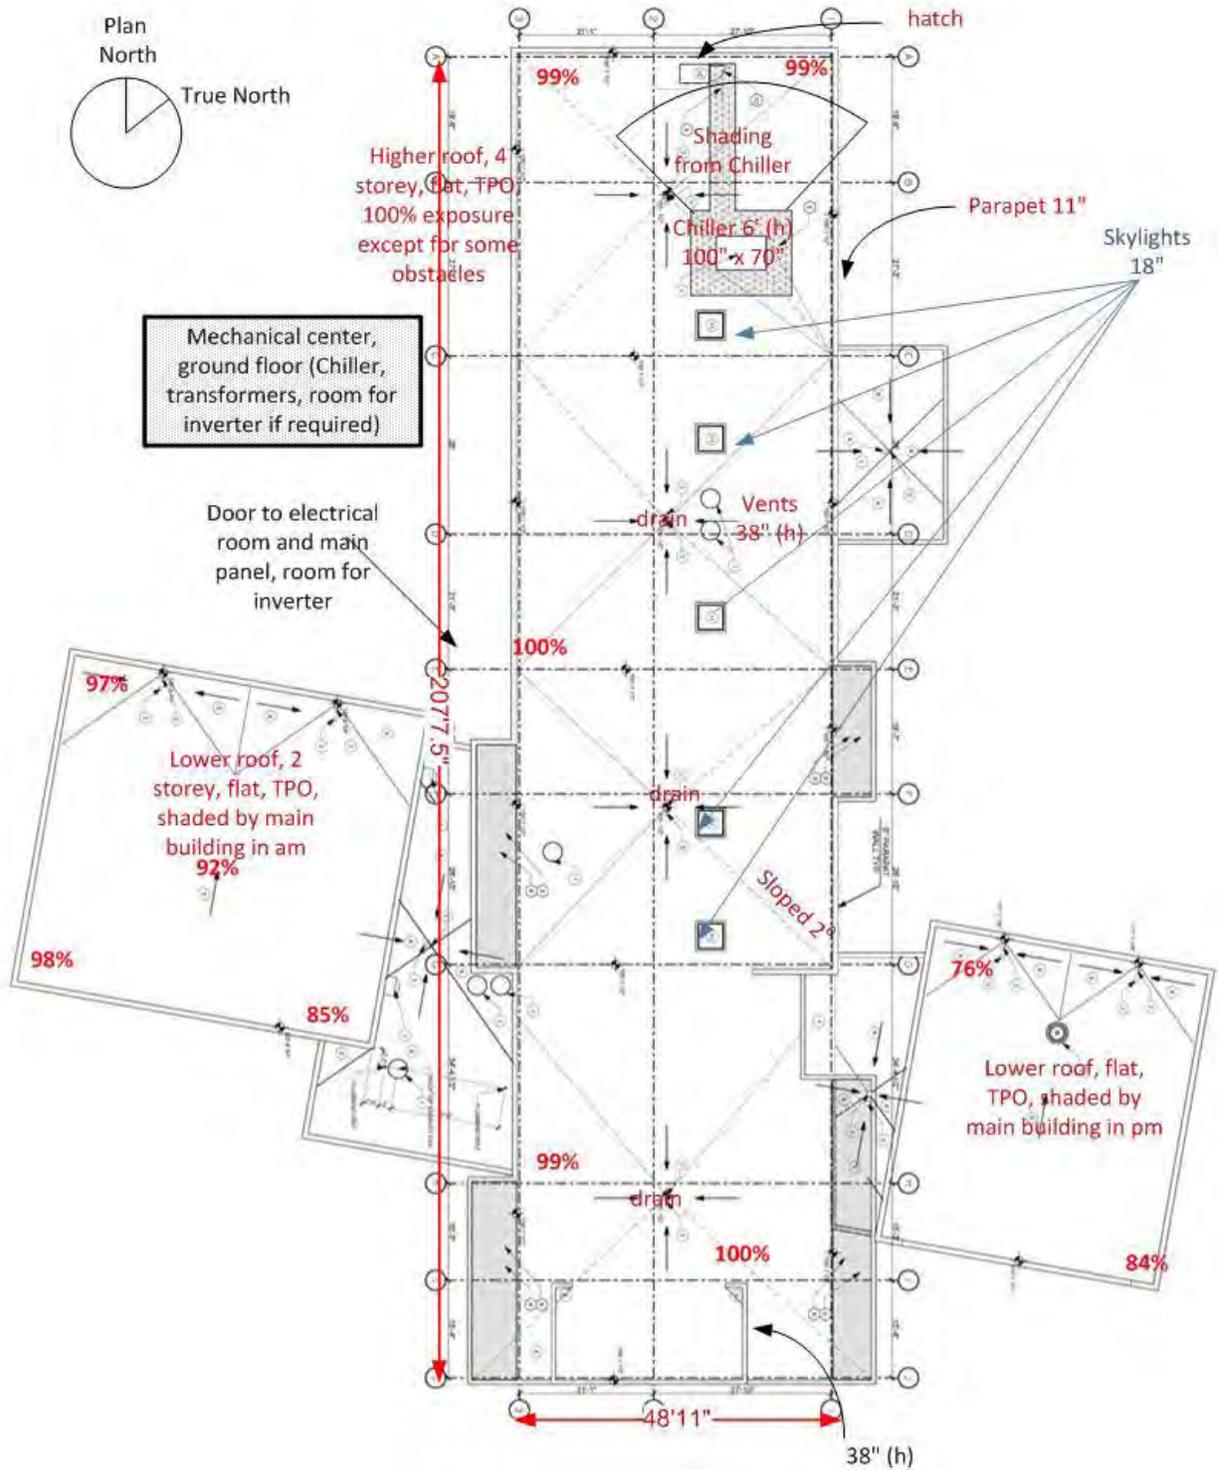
Tanner Roof with Dimensions, Obstacles and Solar Access
